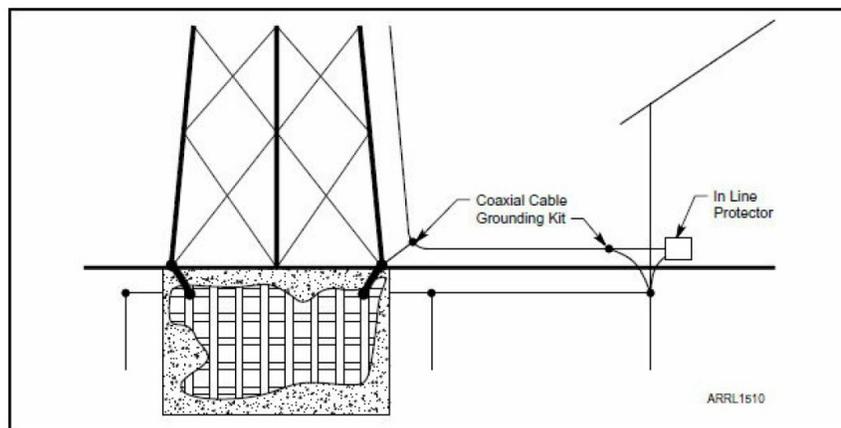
Grounding coaxial cables should be done at both the tower top and the base as well as at the entry point to the house or building. For minimum energy transfer from the tower, bring the coax all the way down the tower and use a cable shield grounding kit. [Drawing from *The "Grounds" for Lightning and EMP Protection*, Roger R. Block, PolyPhaser Corporation, Minden, Nevada]
